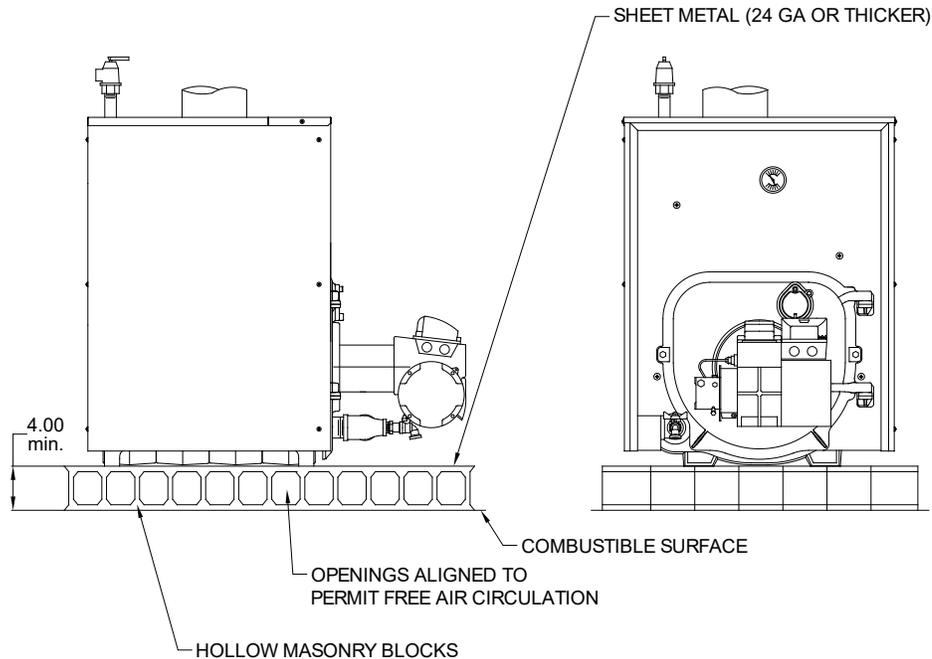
Minimum Installation Clearances To Combustible Materials (Inches)
